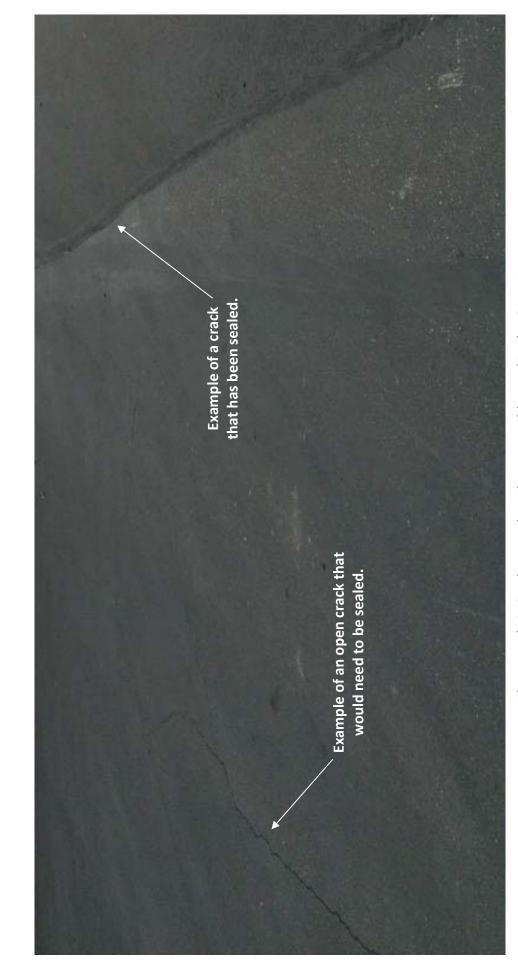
Example of pavement "spider" or "alligator" cracks that would warrant additional inspection and repair under the proposed OMMP.
